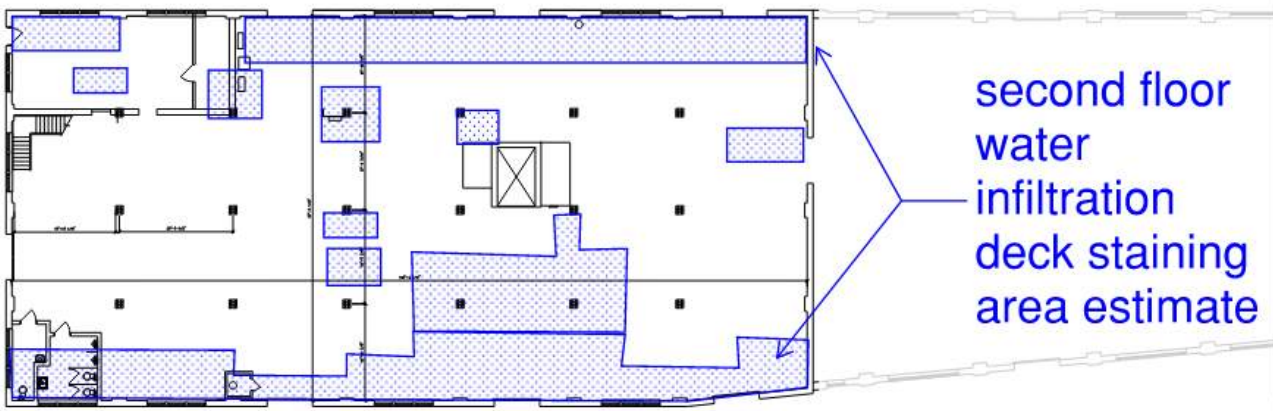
South Building Second Floor Board Decking Water Staining Area Estimate
